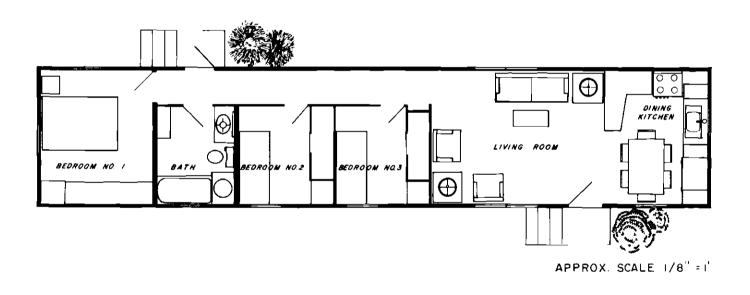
Floor Plan of Typical Three Bedroom Mobile Home Unit (25)
